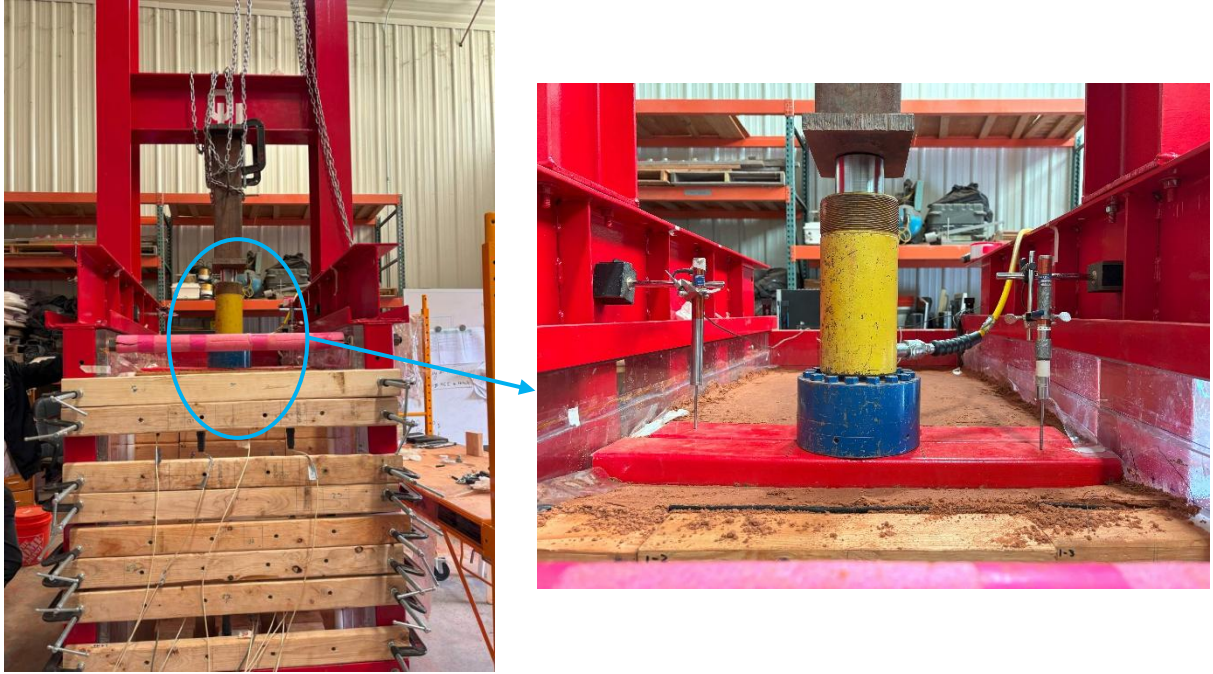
Loading arrangement used for model abutments, including the hydraulic jack, load cell, and vertical loading column setup
